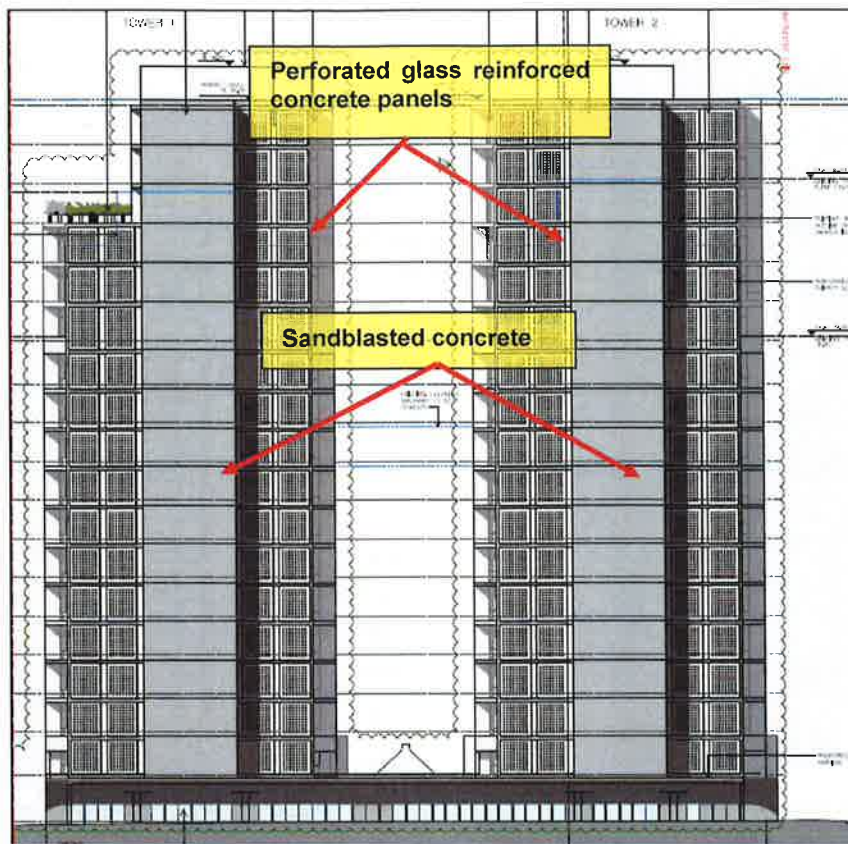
Southern elevation of Towers 1 and 2 approved under MOD 2
